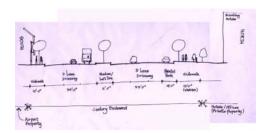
Cross Section- Proposed streetscape of Century Blvd
